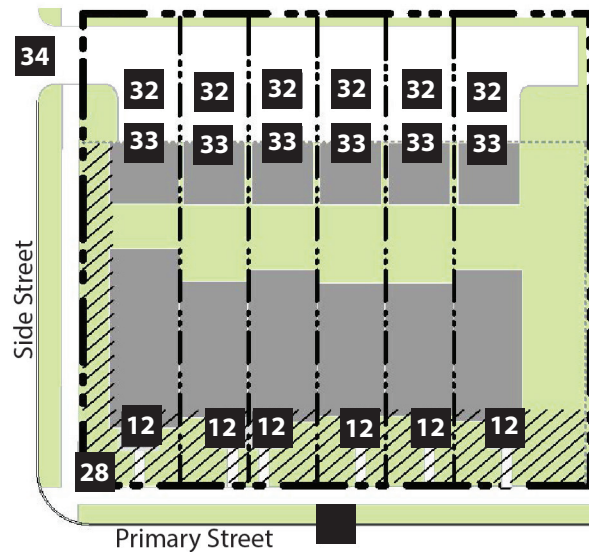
Row building siting diagram shown with detached garages and rear vehicular access. Not to scale.
